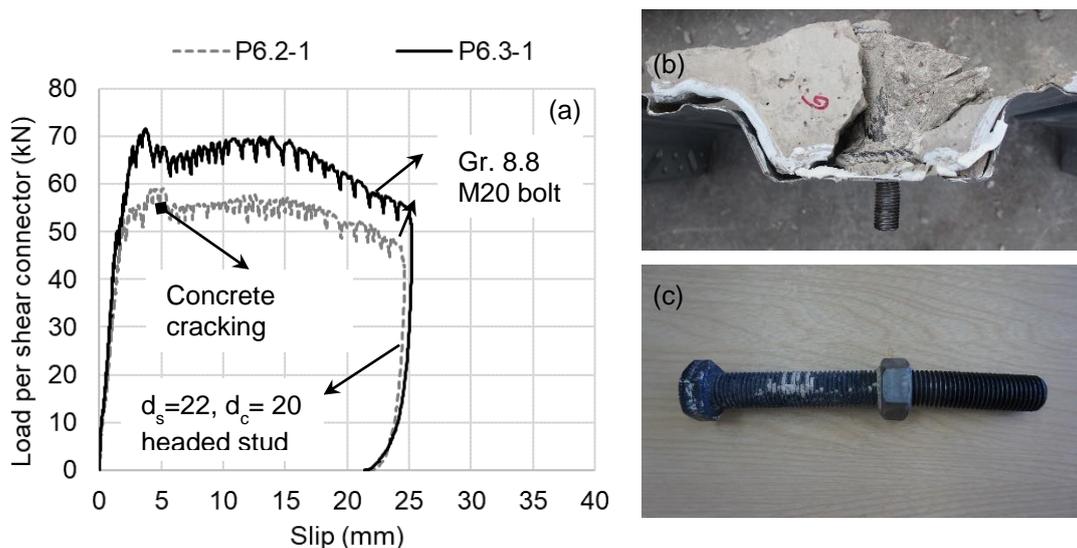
Results from P6.2-1 and P6.3-1: (a) load vs. slip curves (b) concrete cone with deformed headed stud (c) deformed bolt after test
